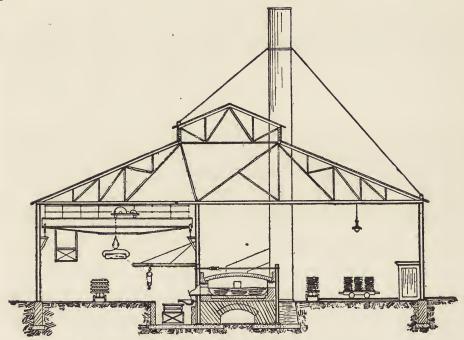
SECTION THROUGH FURNACE BUILDING.
